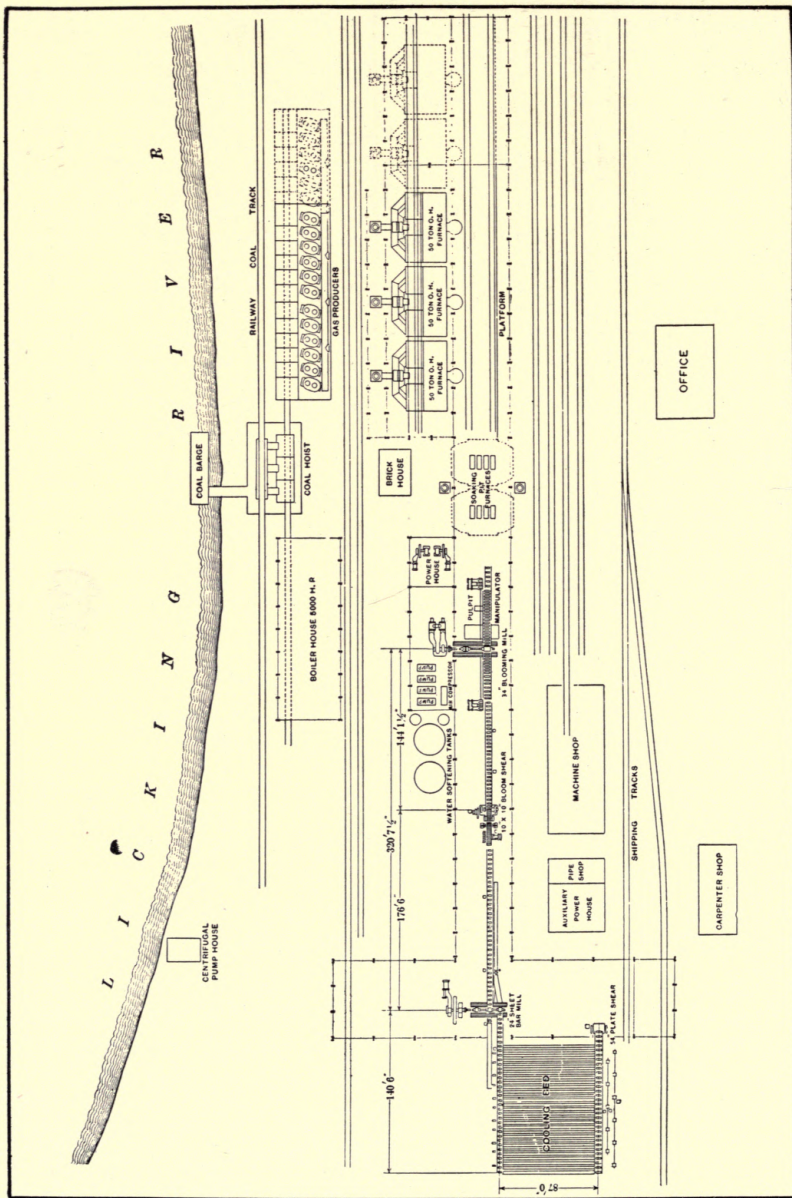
Bloom and Sheet Bar Mill, Andrews Steel Co., Newport, Ky.
